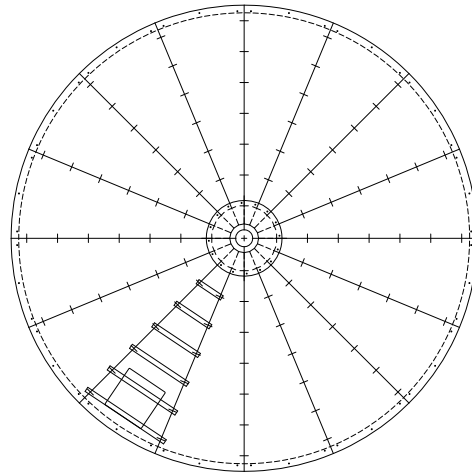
Fixing the first two roof plates. Do not fix the centre cone of the roof yet.
